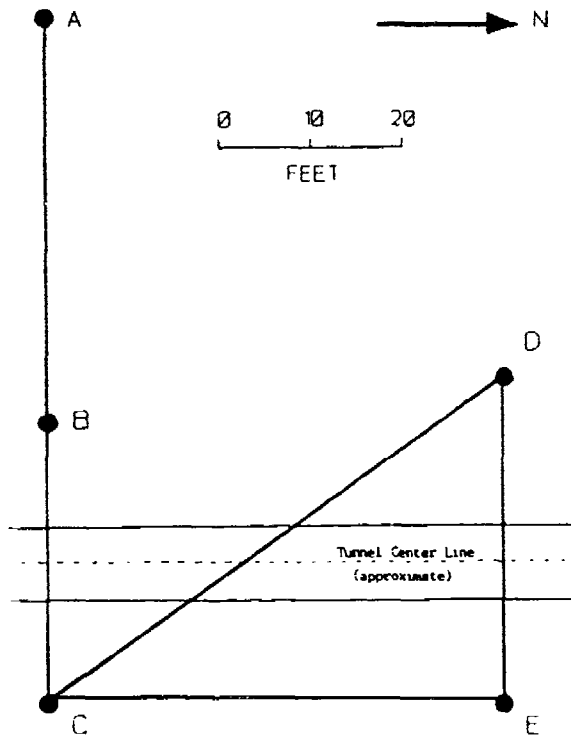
Plan map of borehole locations, Belvoir Tunnel Site.
